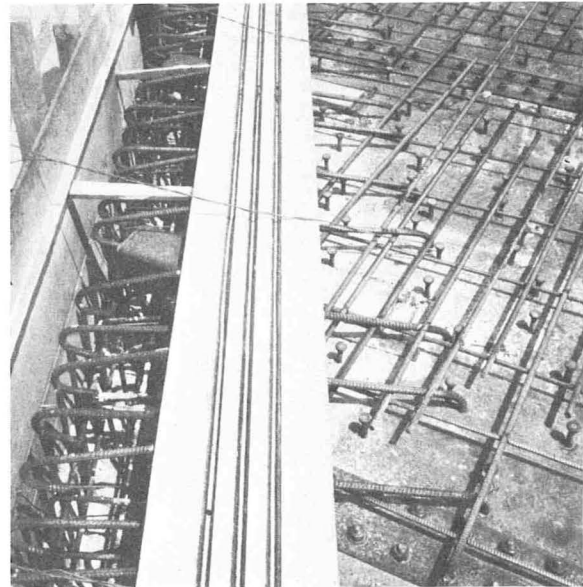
D. Modular system in place after prestressing for temperature-width prior to concrete placement (Bayonne River Bridge).
